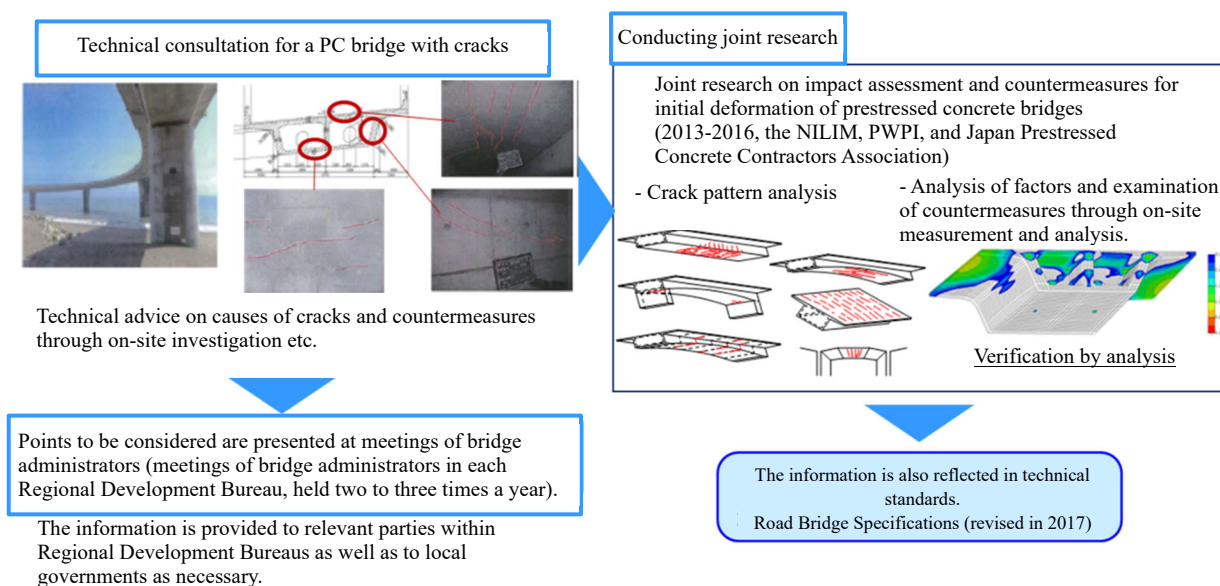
Revision of the Road Bridge Specification regarding cracks in PC bridges
